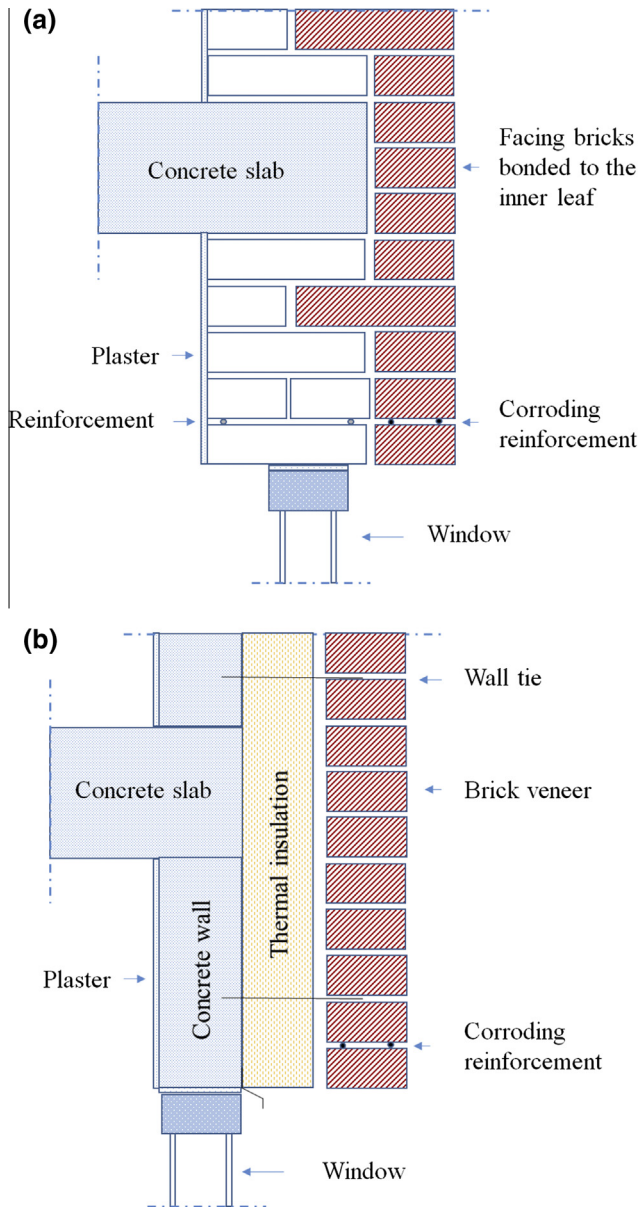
Wall sections with corroding bed joint reinforcement: a) faced single leaf brick wall; b) brick veneer.
